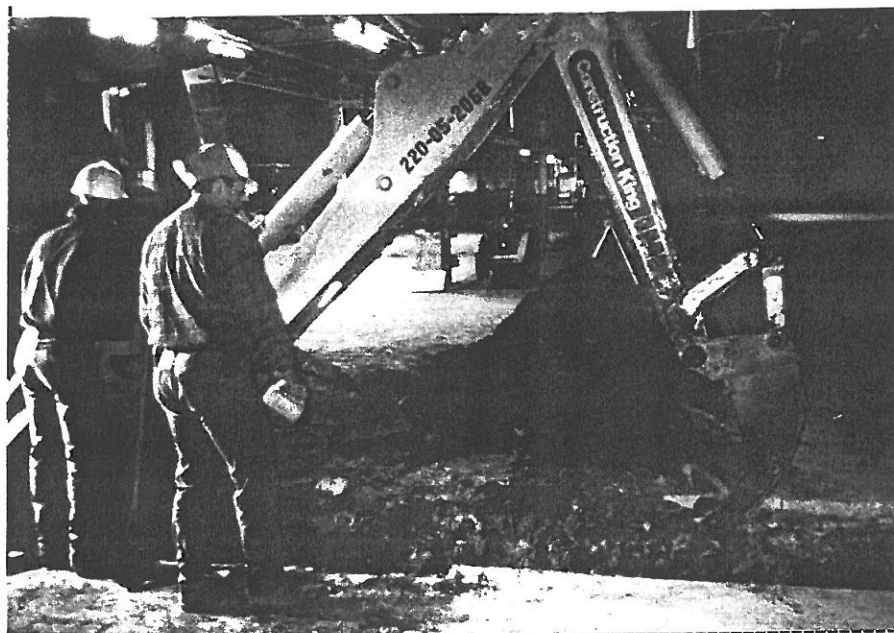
BACKHOE TRENCHING TOWARD ESP FROM THE WEST
